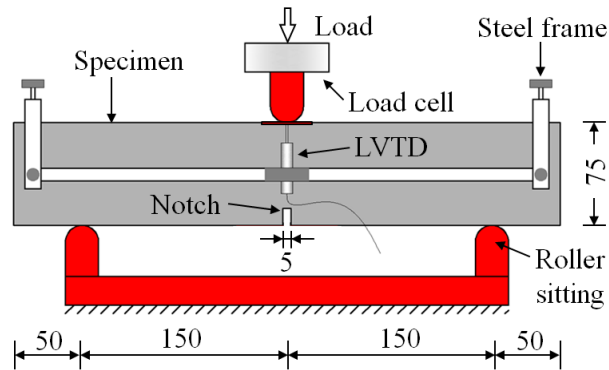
Flexural test setup and notched beam specimen. Unit: mm.
